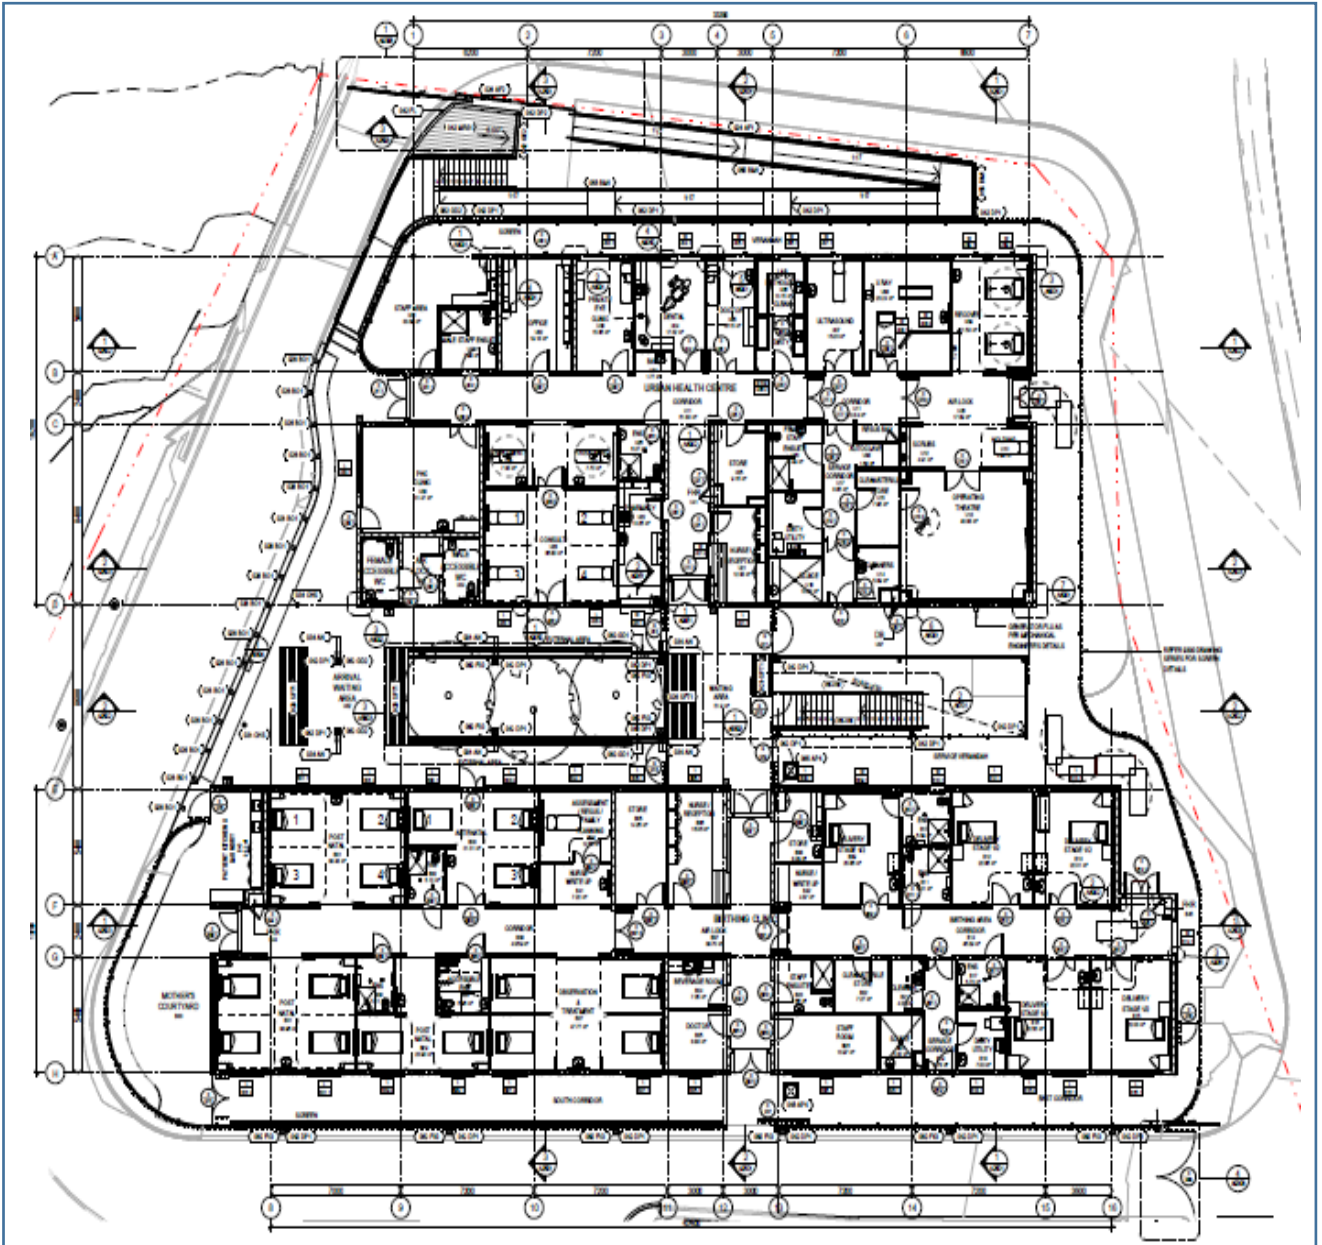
General Arrangement Plan –Ground Design - Architectus Brisbane
